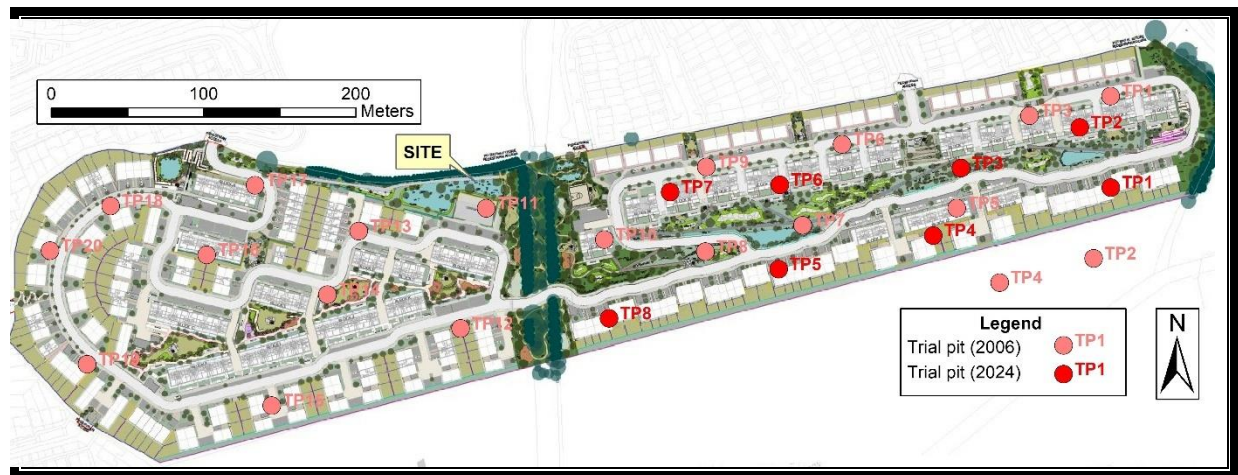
Location of trial pits excavated across the proposed LRD Site area.
